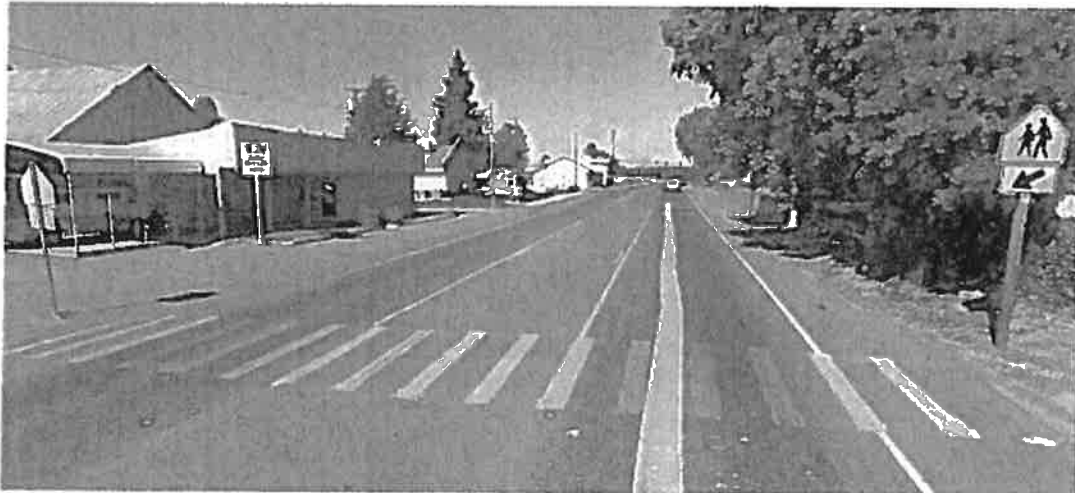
School crosswalk with longitudinal lines across 6<sup>th</sup> Street at Los Robles Avenue
